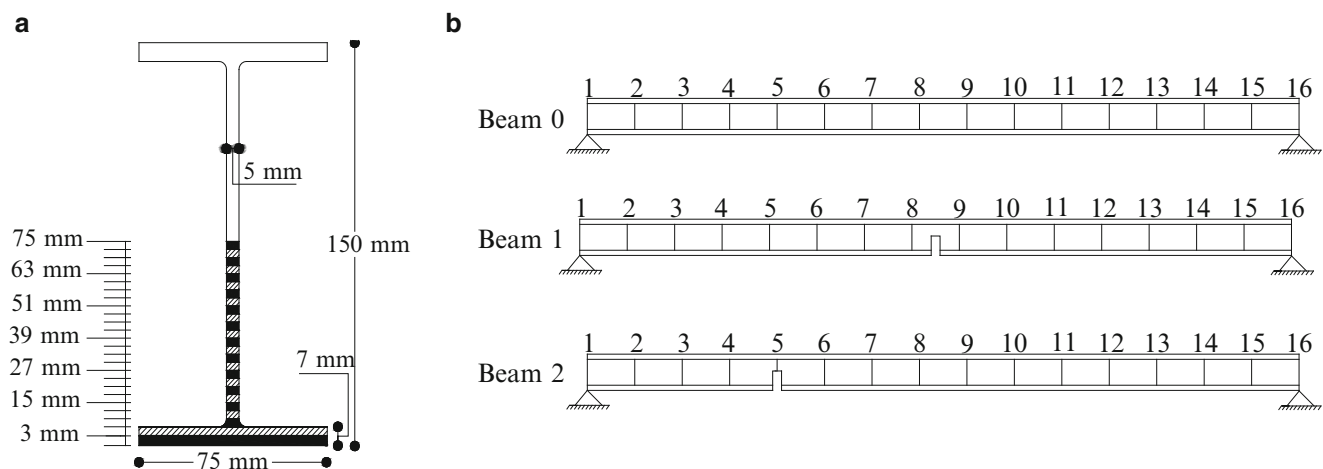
I-beam damage scenario: (a) dimension and damage depth of beams; (b) damage location of beams
